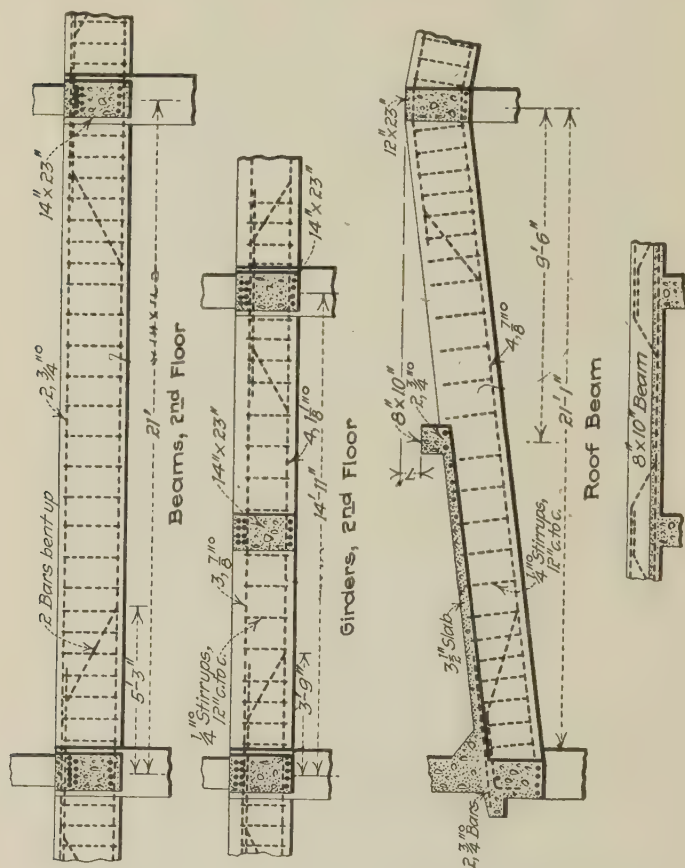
GIRDERS AND BEAMS IN BUILDING.
